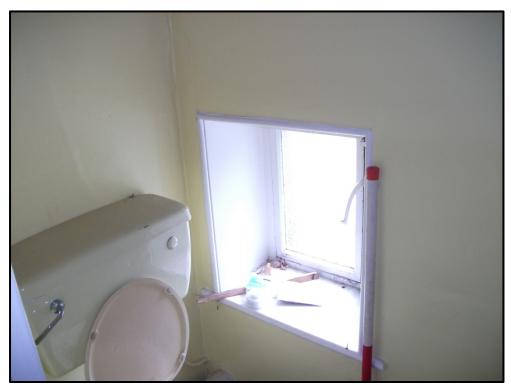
Detail of window on the south wall of the first floor WC (F1).Looking south-west
